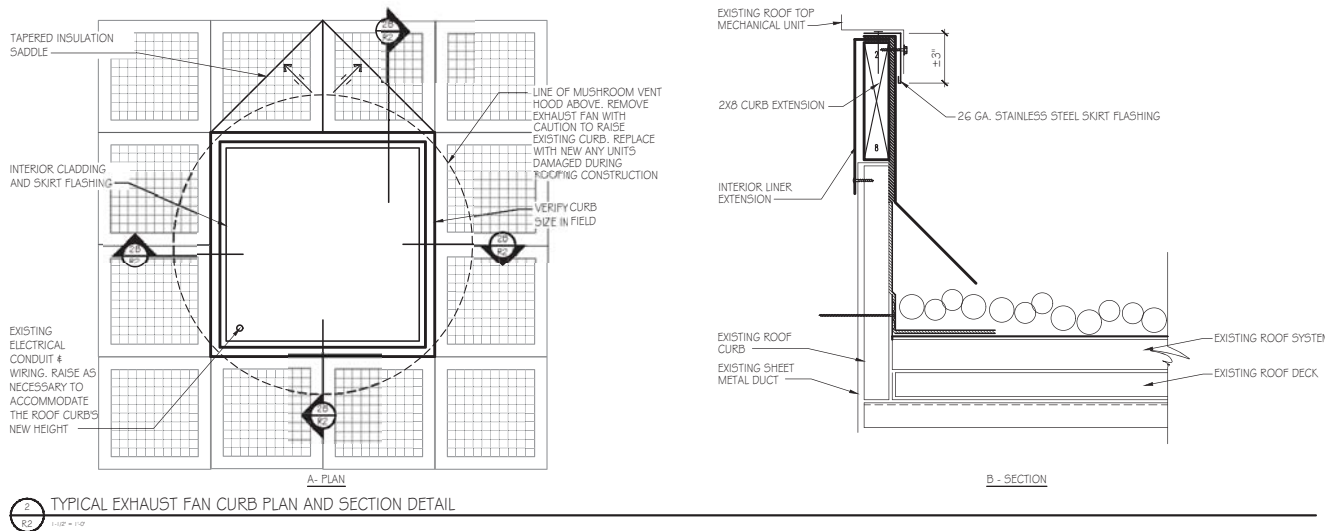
The existing roof curbs were raised to accommodate the new insulation height and pre-flashed. A skirt flashing was installed over the top prior to the installation of the new roof system.
